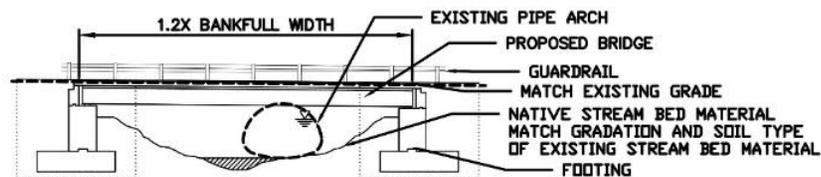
Typical detail of a replacement bridge designed to meet the MA River and Stream Crossing Standards.
